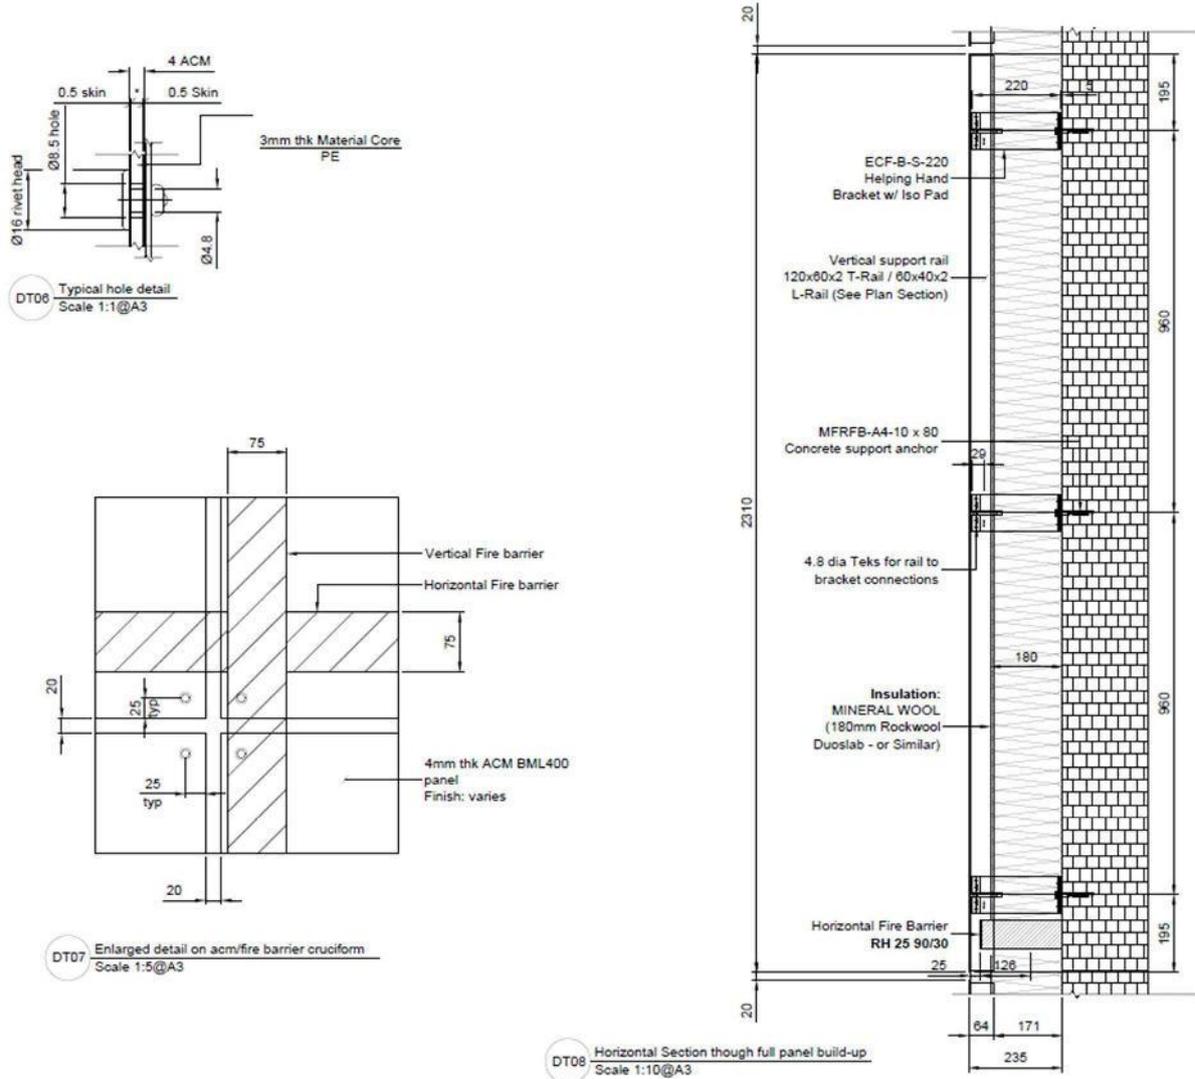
Vertical section through the cladding system, ACM panel detail and vertical and horizontal fire barriers intersection (supplied by the Test Sponsor).
